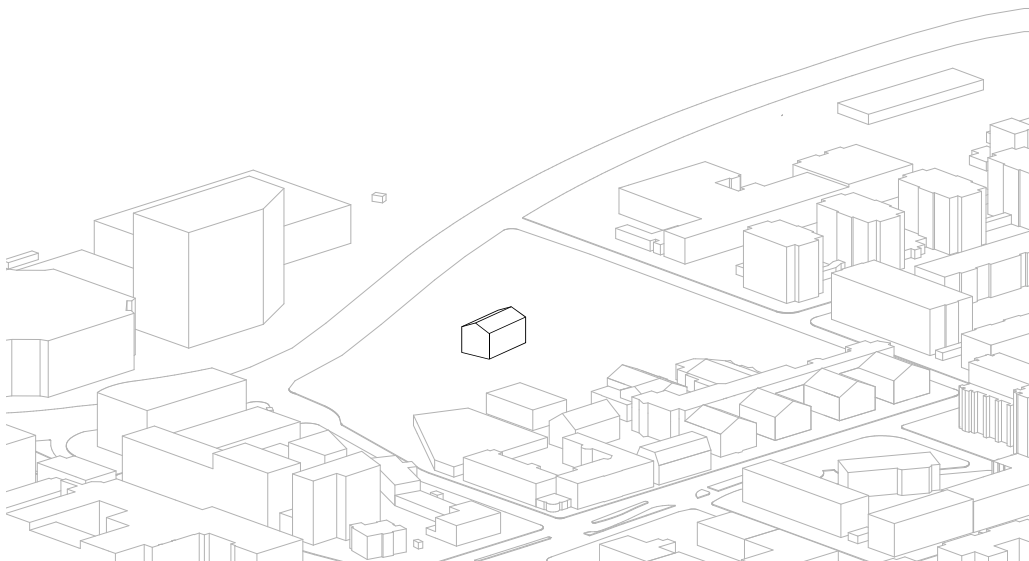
The existing brick building on the site is defined as the central point of the project.
